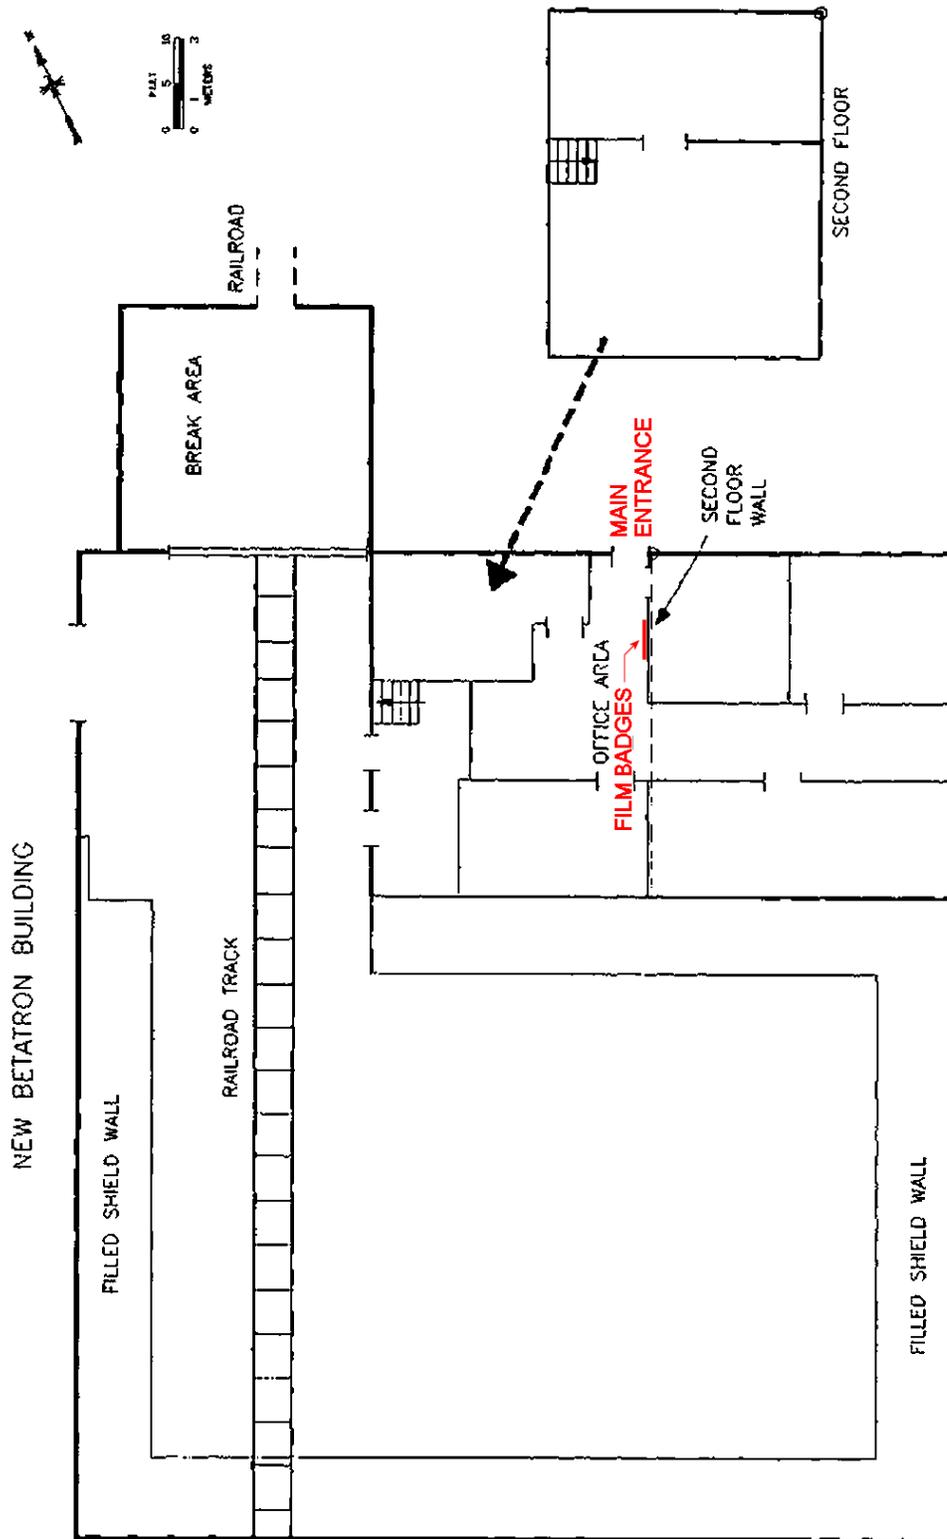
Floor Plan of New Betatron Building, Showing Location of Rack for Storing Film Badges. (Original drawing from Murray and Uziel 1992—entries in red by present authors)
